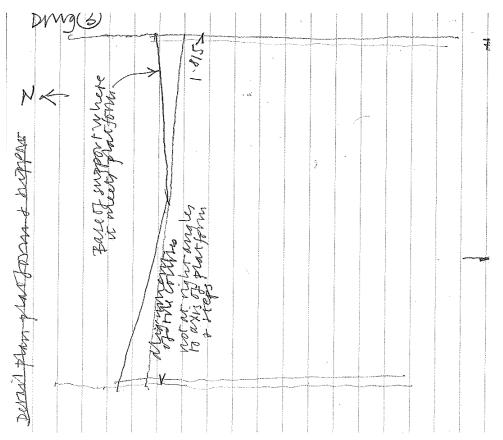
Site working drawing (3): dimensioned sketch plan of a detail of the ramped concrete support under the second flight of steps
